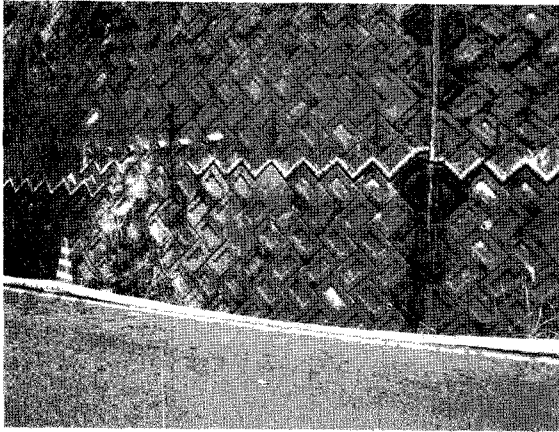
Lateral tension crack on the retaining wall before snowfall
